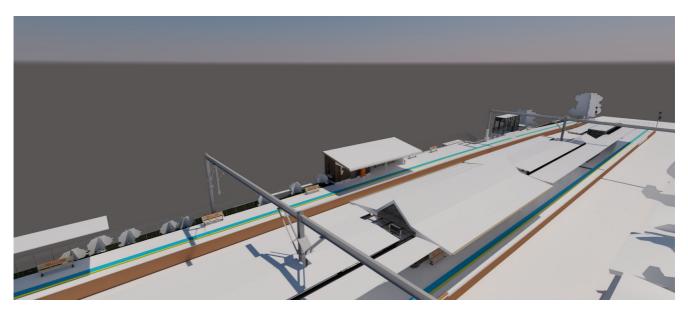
Platform 2/3 canopies and southern junction with the station building; facing northwest
